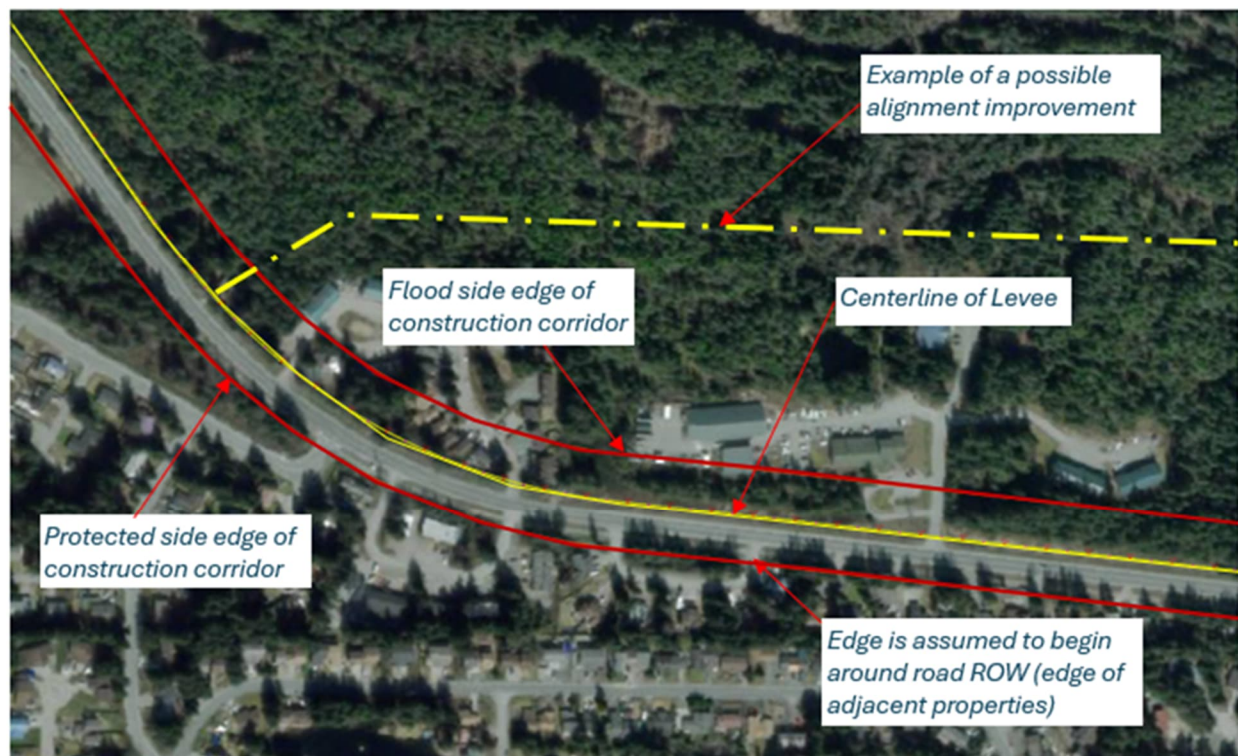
Example Levee Alignment (Neighborhood Southeast of Mendenhall Loop Bridge Shown) with 225-Foot Construction Corridor
